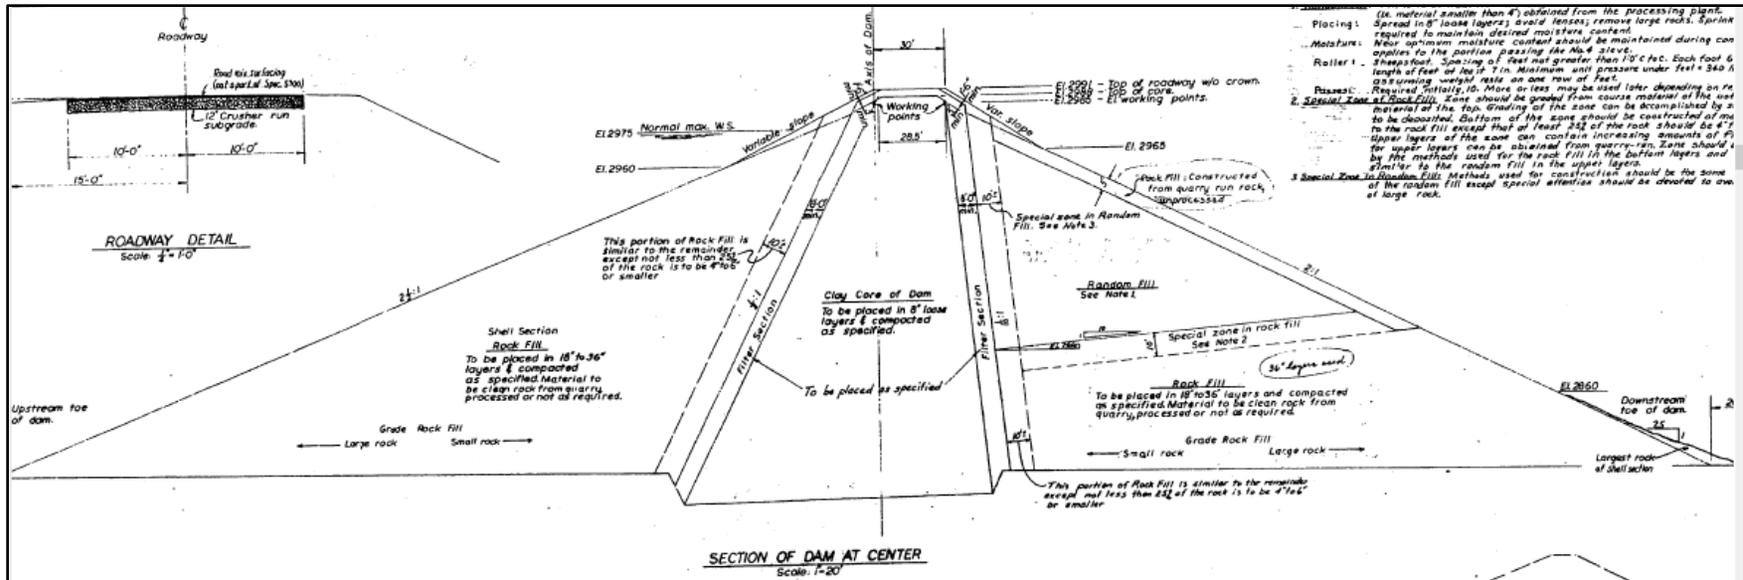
Maximum section at Belden Forebay Dam (note elevations are in PG&E datum)
